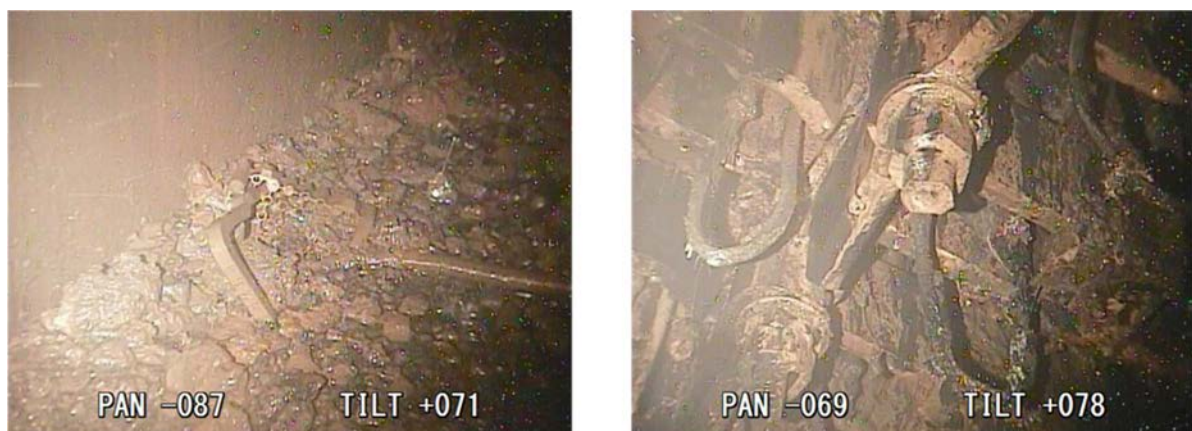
Image of pedestal bottom (left) and lower part of control rod drive (right) in Unit 2 PCV (reproduced from Ref. [262] with permission courtesy of IRID).
